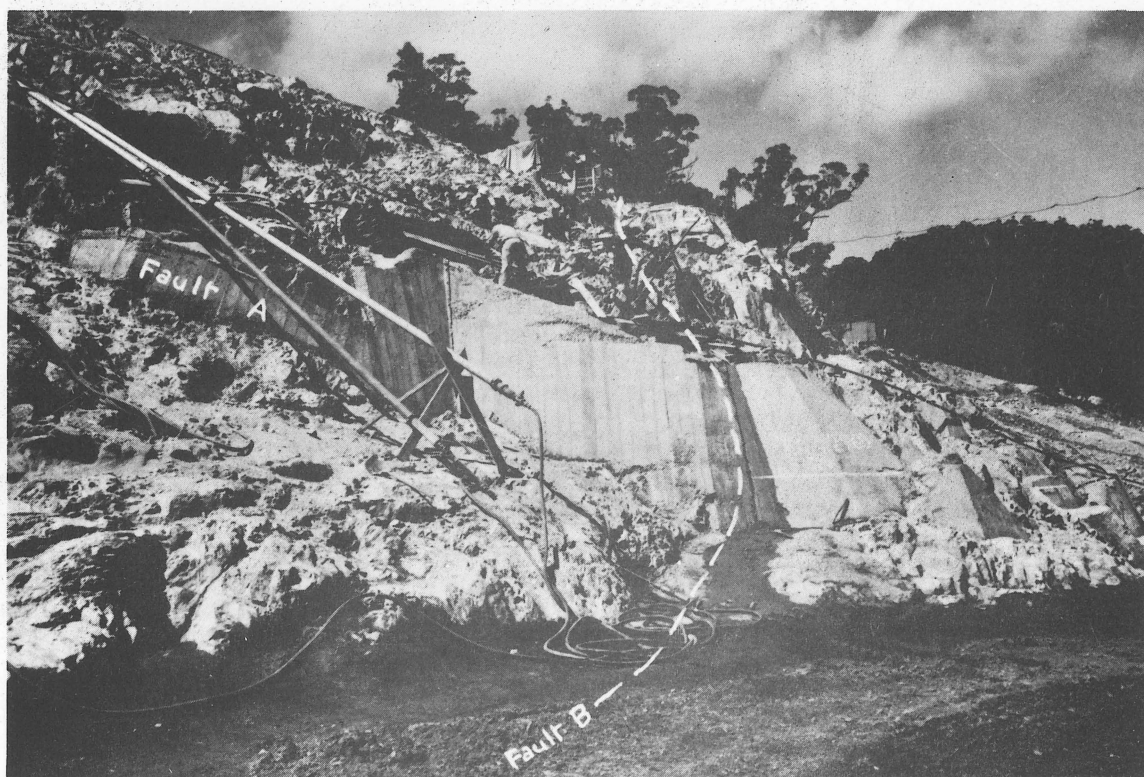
Dental concrete foundation treatment after the excavation and concrete backfilling of Fault A. This view looks upstream to the intersection of Fault A by Fault B. Small areas of concrete dental treatment of steep rock faces can be seen downhill of the trace of Fault B.
